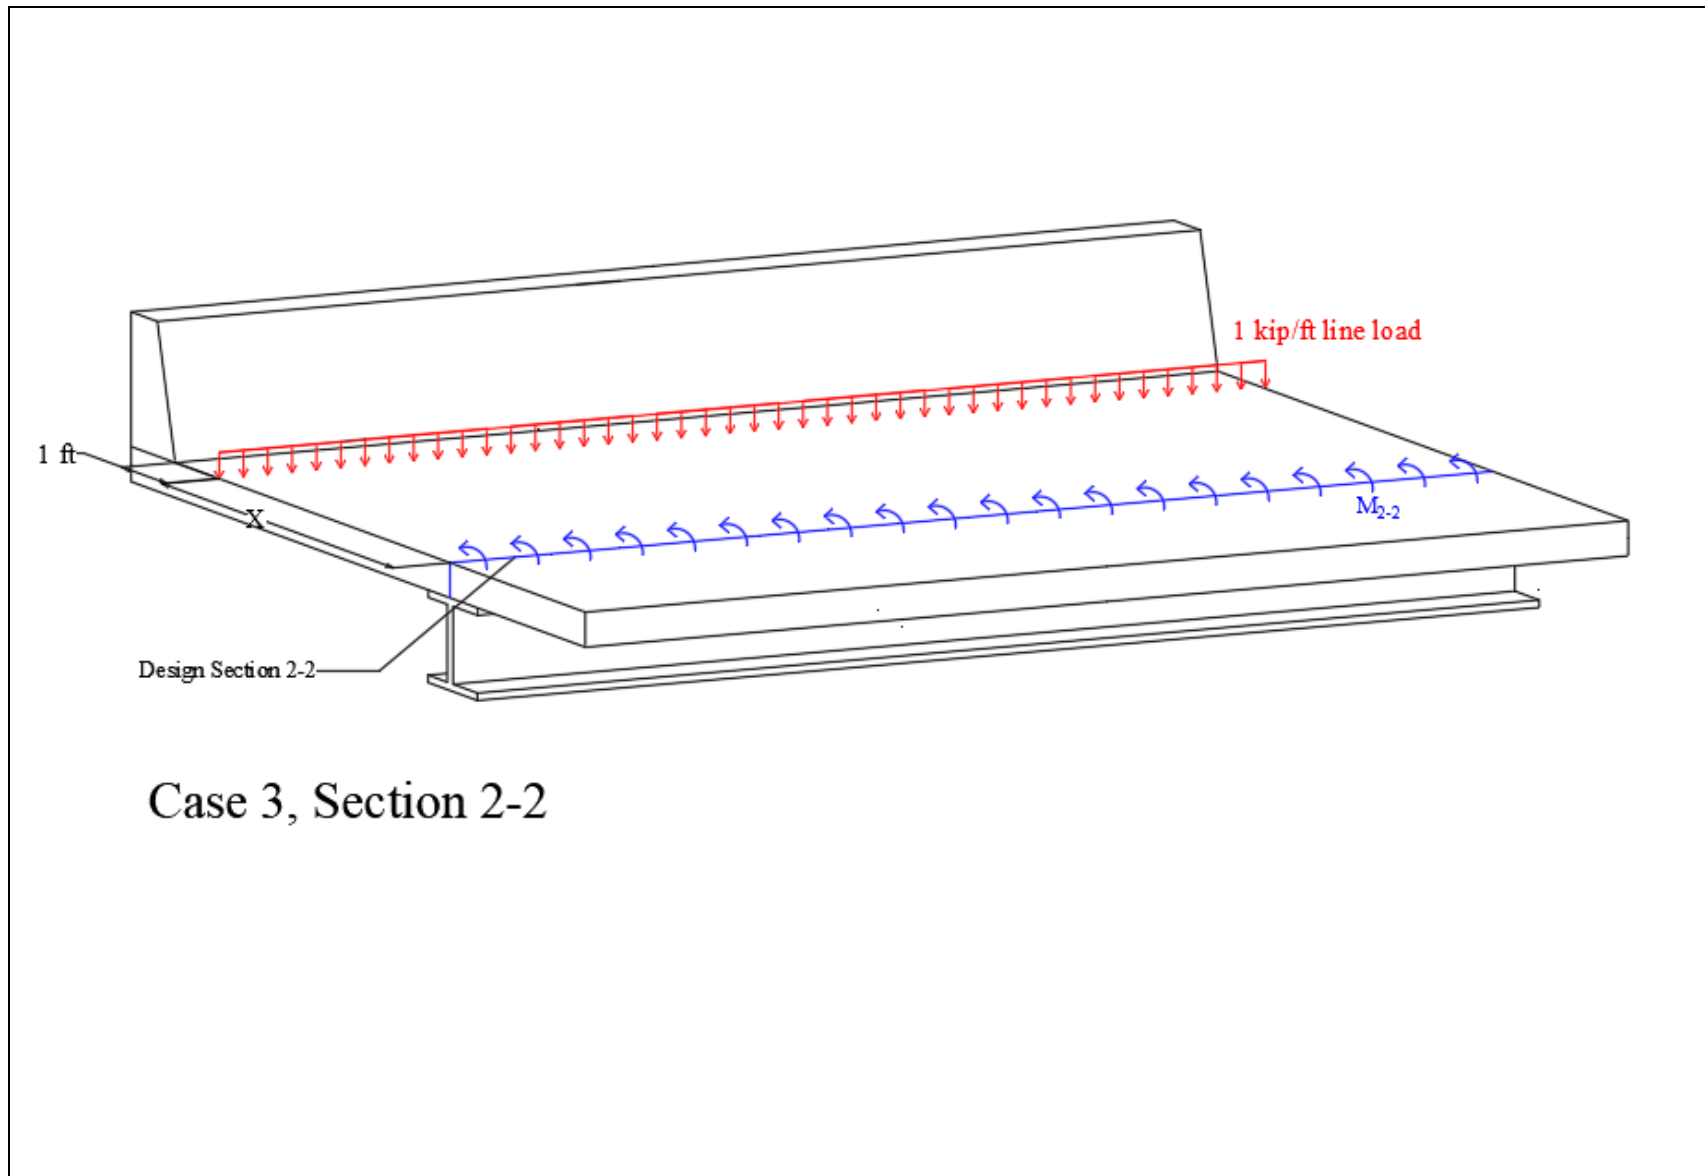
Generic Bridge Rail for Load Case 3, Section 2-2
